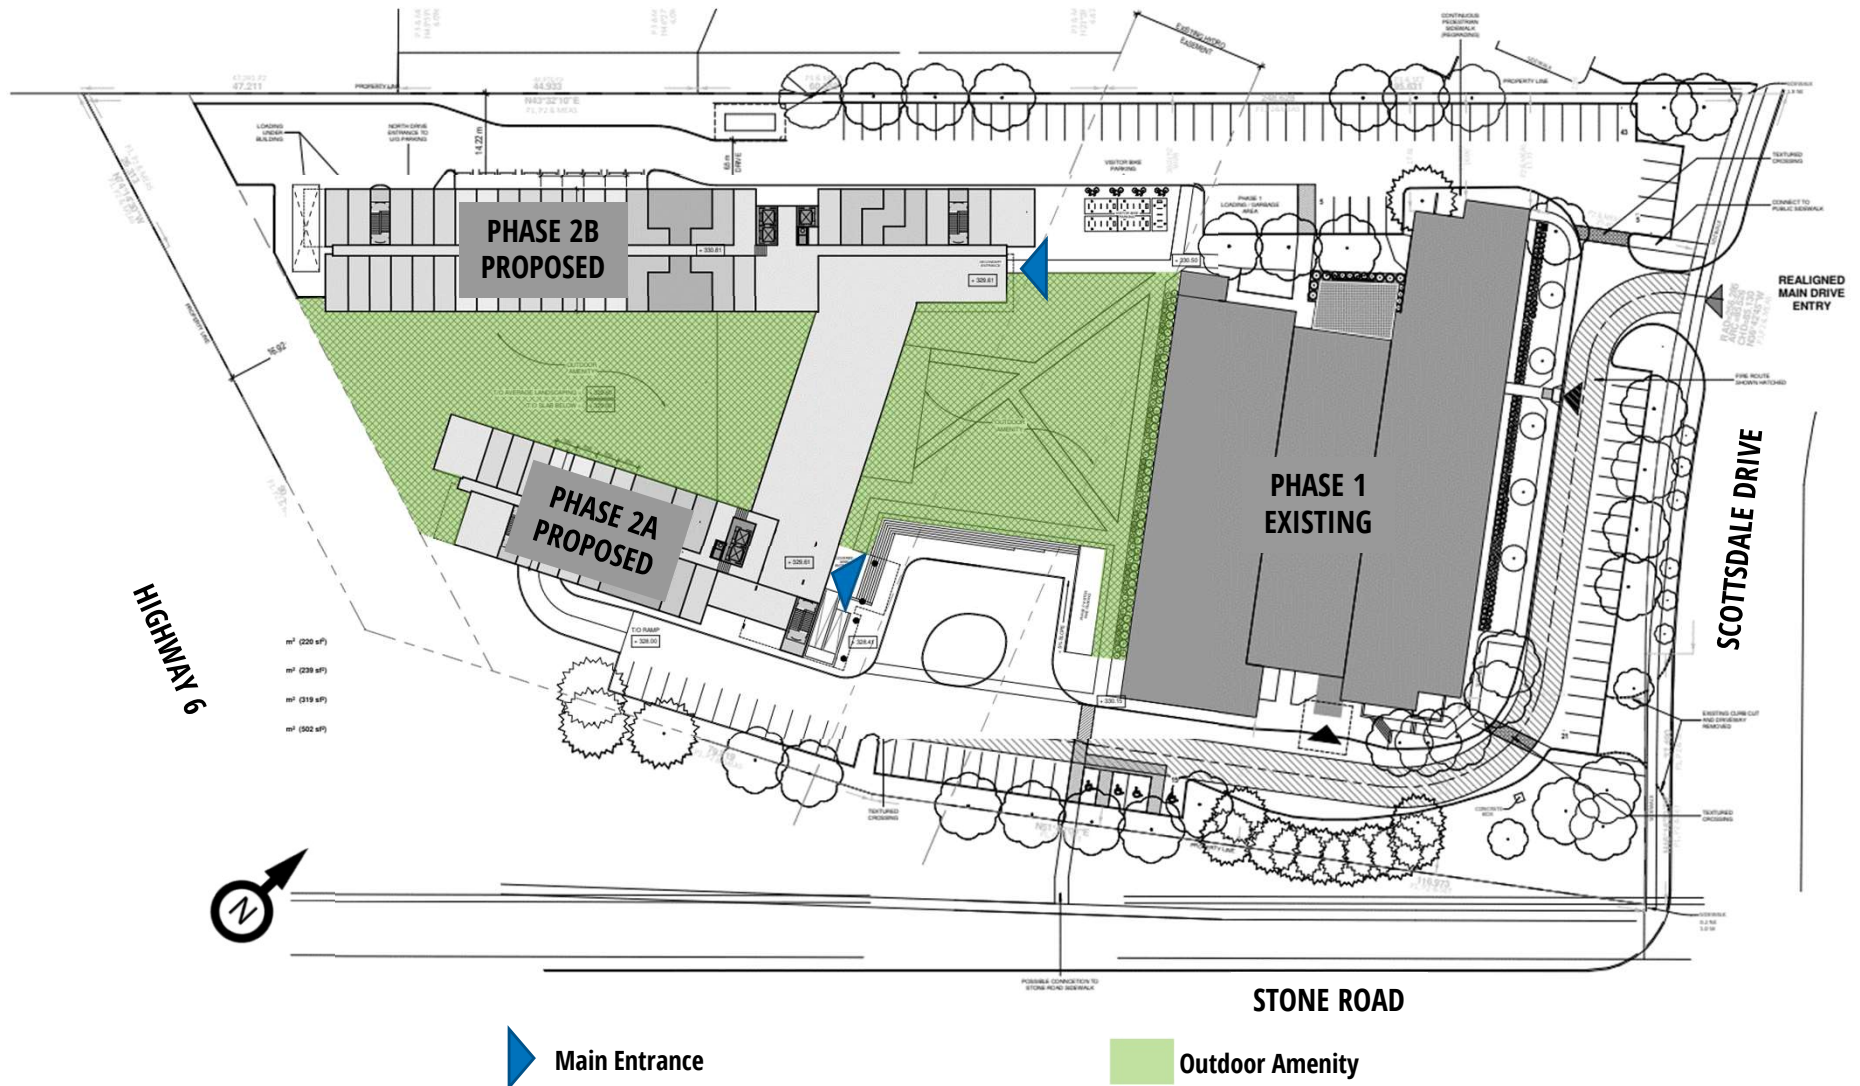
Ground Floor Plan Identifying Key Outdoor Areas of Interest
